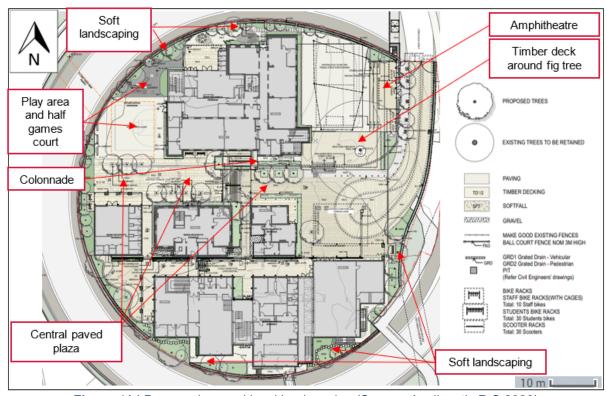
| Proposed ground level landscaping (Source: Applicant's RtS 2020)
